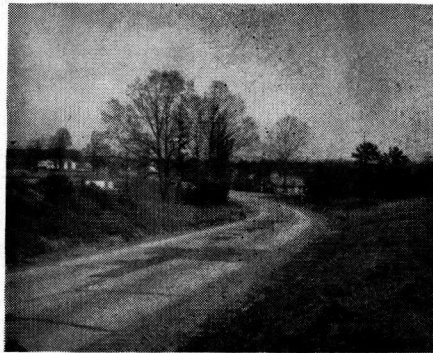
Figure C. A portion of the pavement with coarse aggregate "B" showing ravelling and spalling at cracks and extensive mapcracking. Note particularly the extensive amount of patching.
